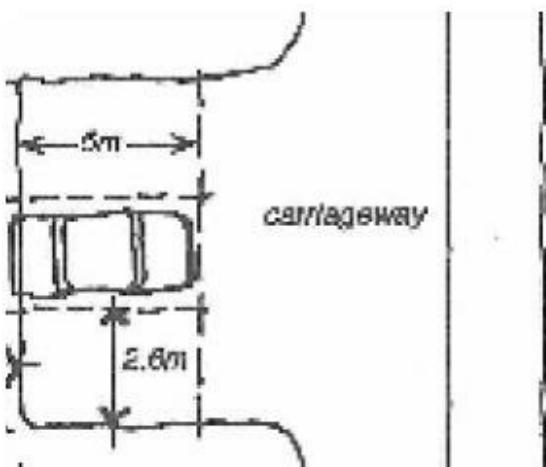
On street parking should allow for sufficient turning area which does not conflict with traffic
